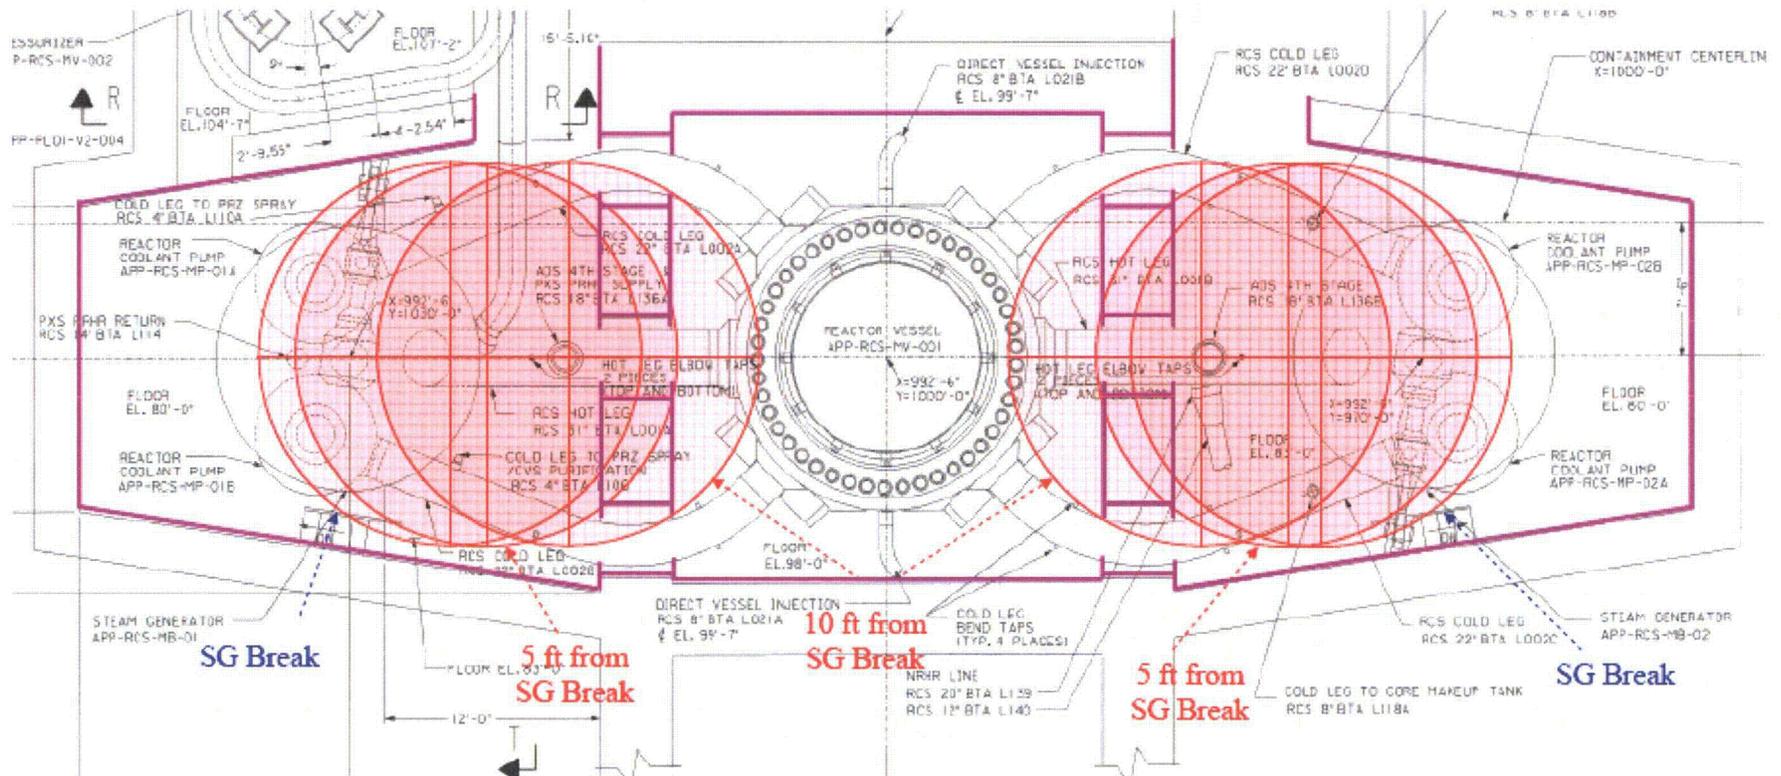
HL Breaks At SG and 5' / 10' Plan View
